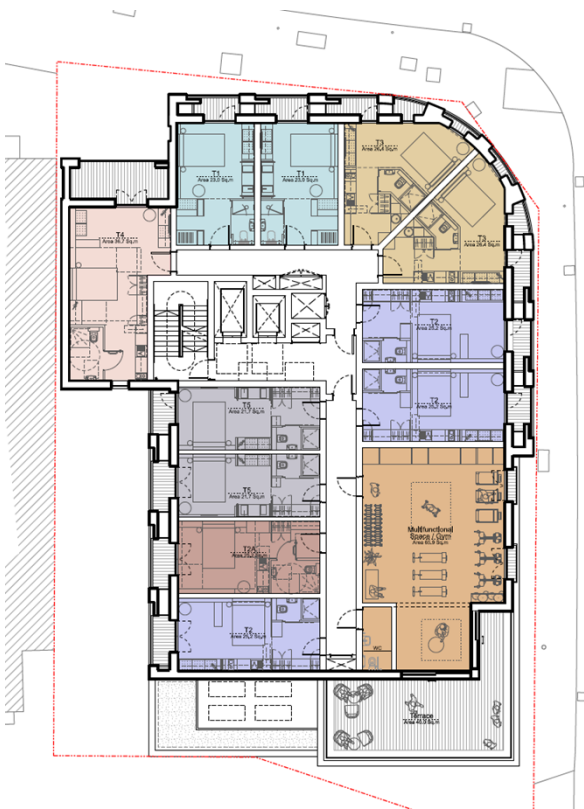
5<sup>th</sup> Floor Plan showing communal gym and terrace.
